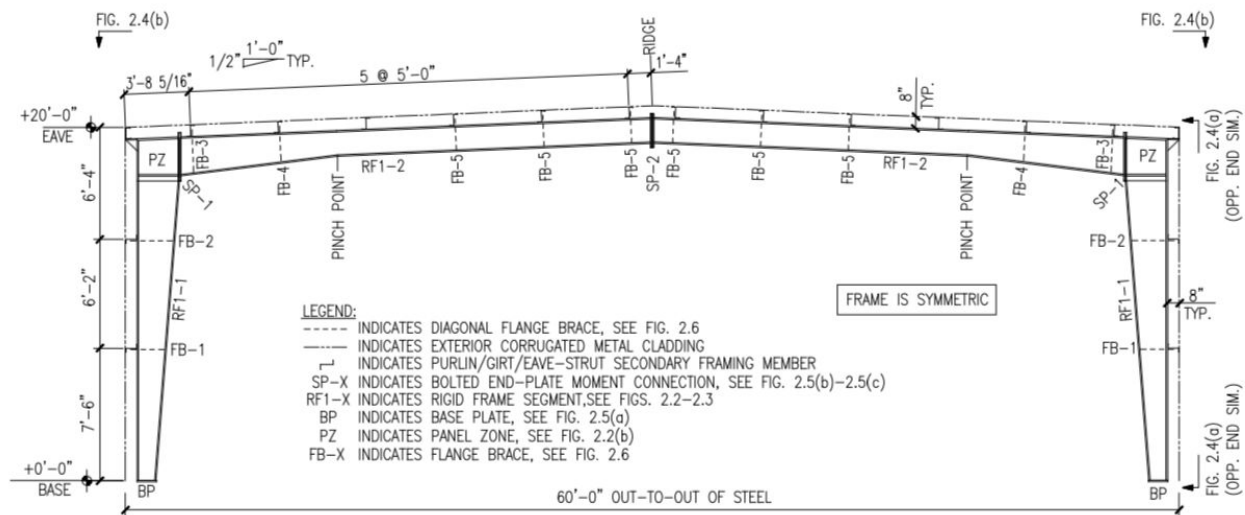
UCSD light wall shake table Specimen B1 made up of two parallel main frames connected with girts, purlins, and panels
